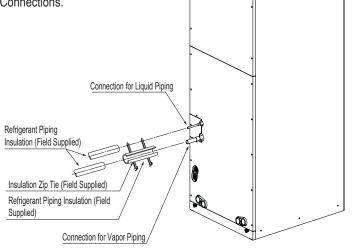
Insulating the Refrigerant Piping and Refrigerant Piping Connections.
